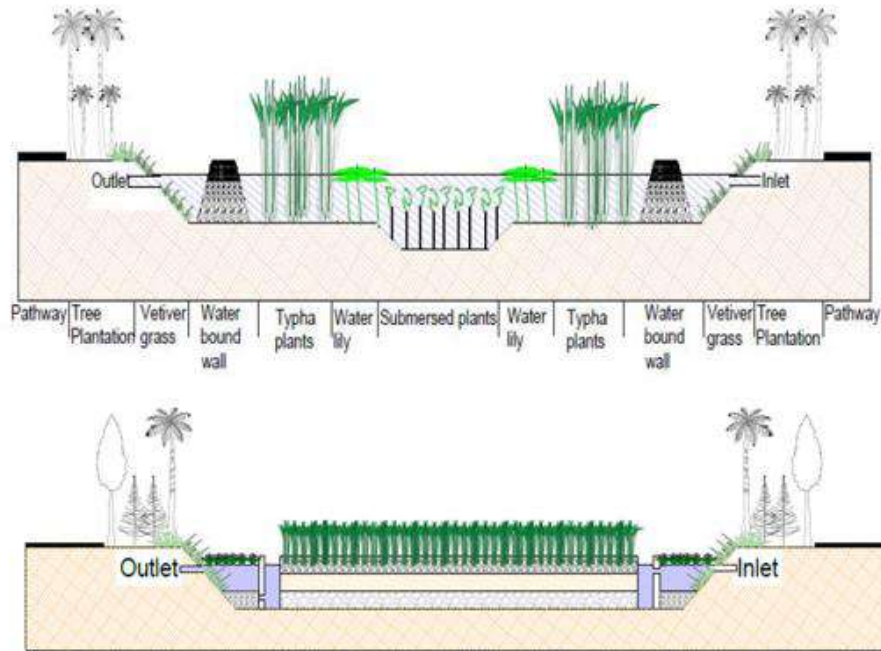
Concept plan of a raised reed bed type Constructed Wetland
